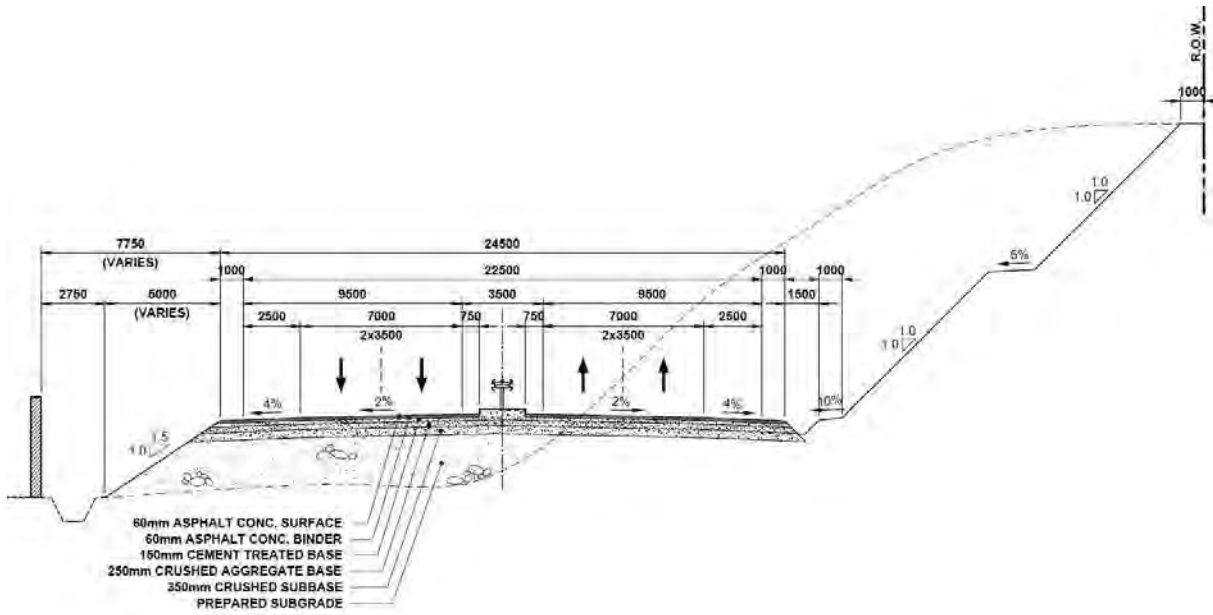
TYPICAL CROSS SECTION: EMBANKMENT AND CUT SECTION
